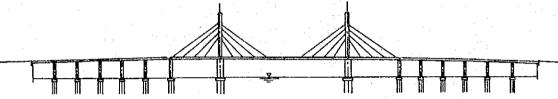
PROPOSED CAUSEWAY CROSS SECTION
